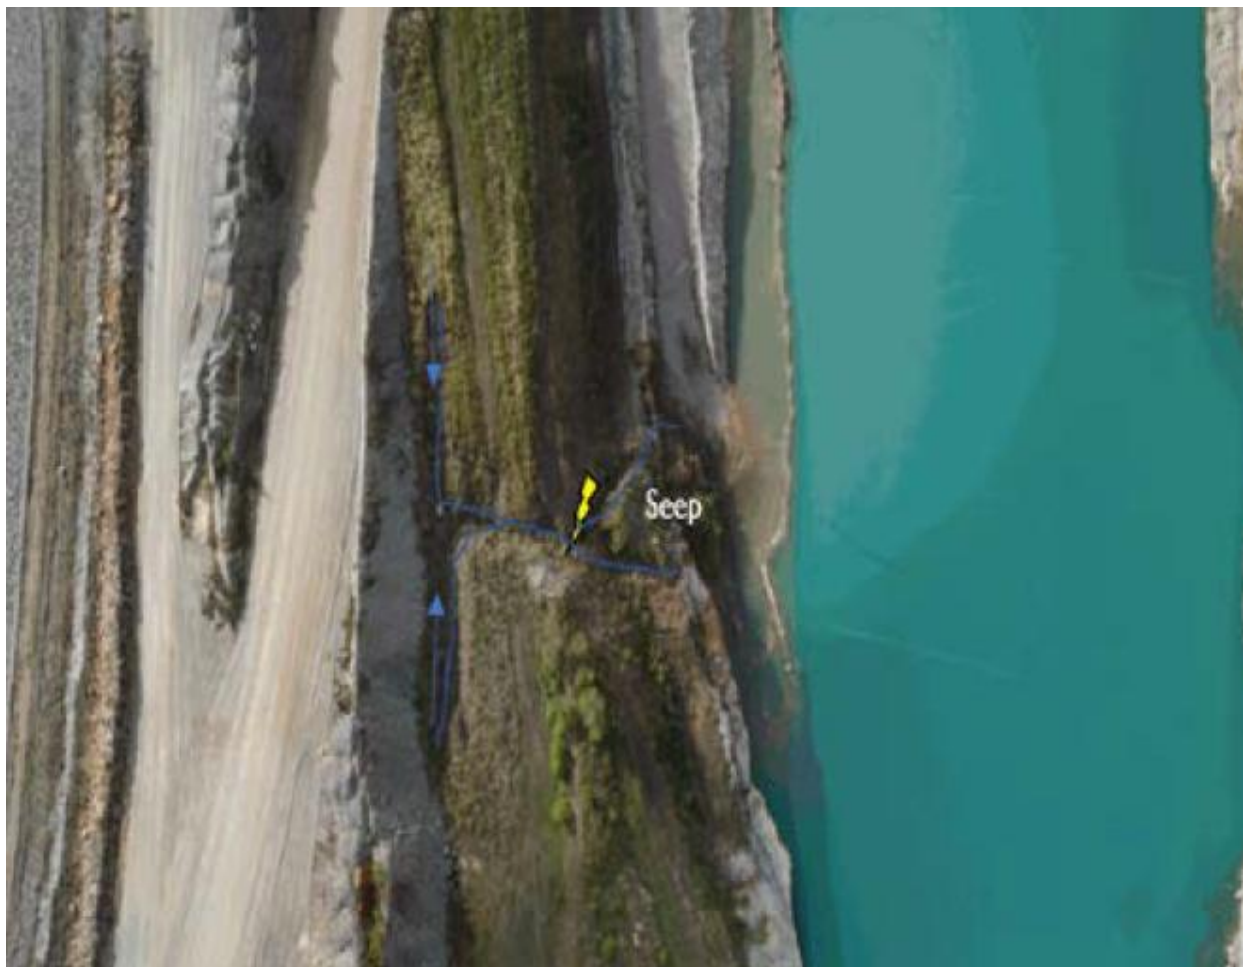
Water can seep from the upper batter on the west wall of Pit 3 when the level of water in Awoonga Dam exceeds ≈ 40 mRL.
